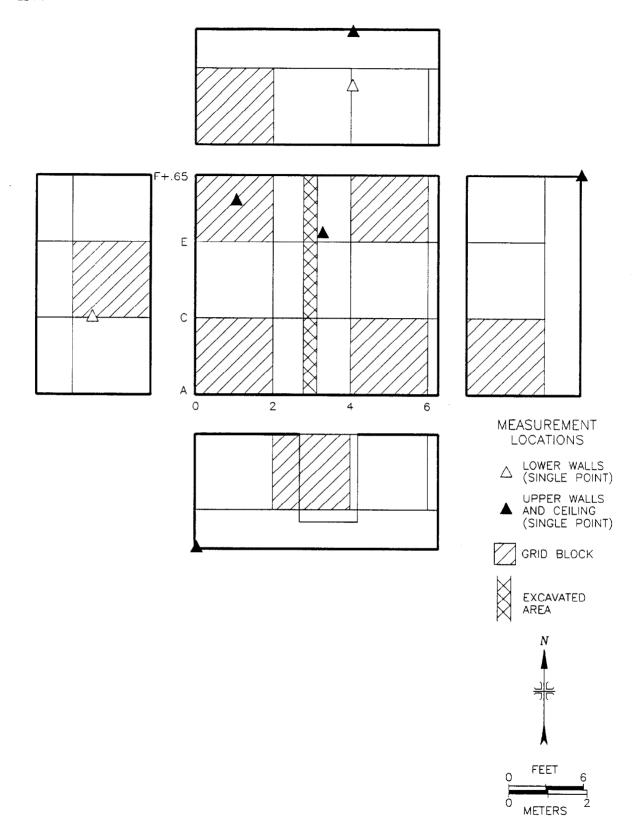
Layout of Room 14, Building 31, Indicating Measurement Locations
